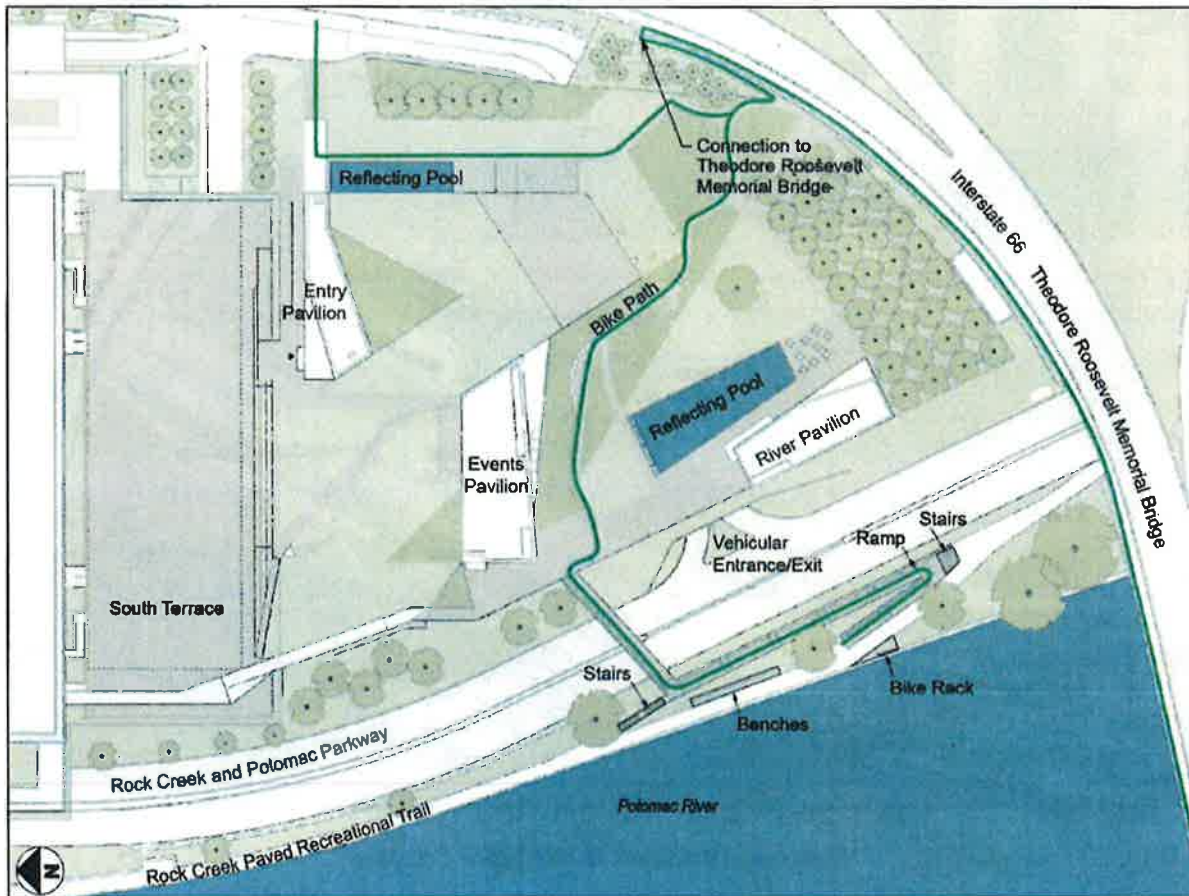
Alternative C - Bridge Access with Ramp and Stairs
